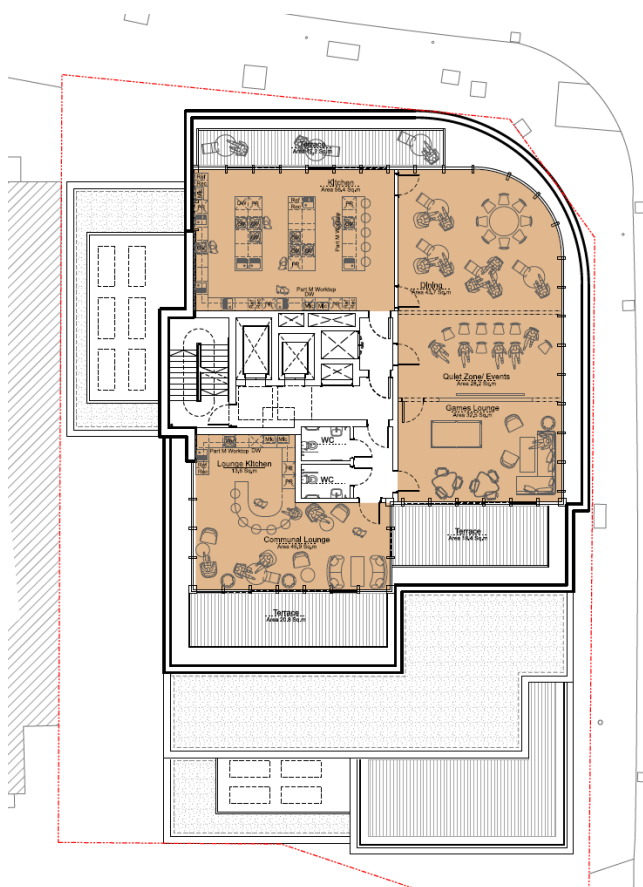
9<sup>th</sup> floor communal facilities and terraces.
